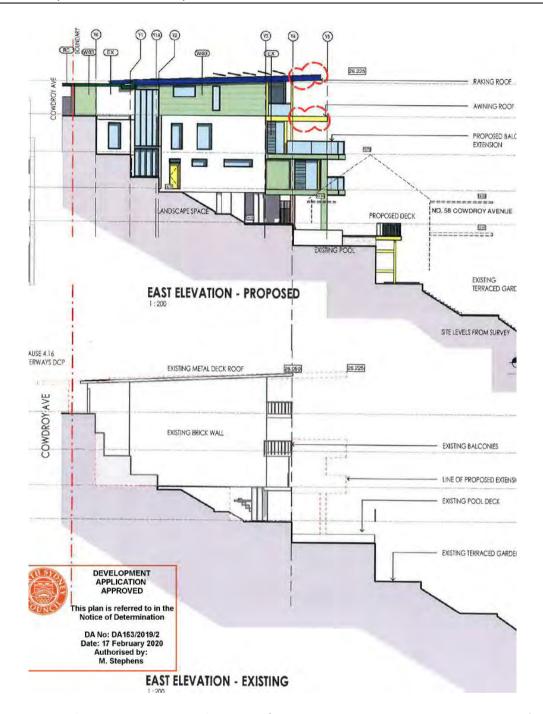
Extract from approved plans for DA153/19 as amended showing the pre-approval (existing) dwelling east elevation (as presented to the subject site) and approved extension of the dwelling and balconies and terraces further north
